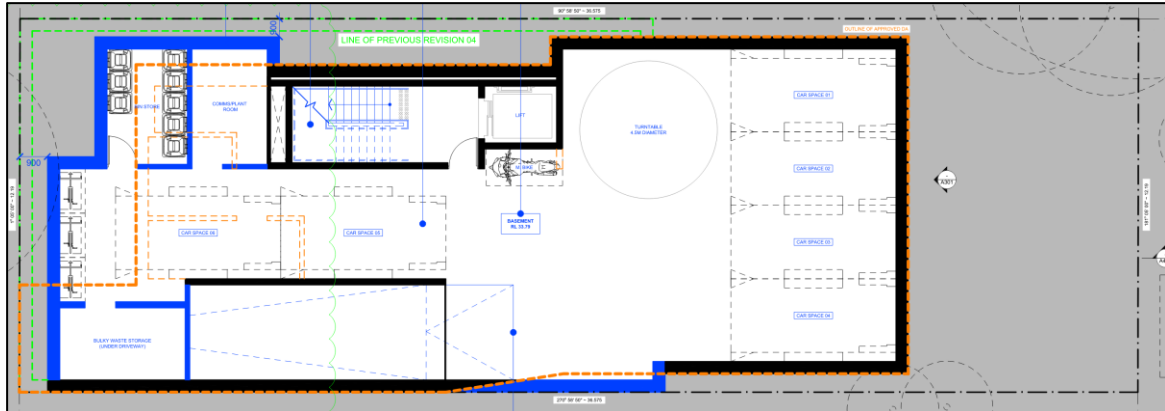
Proposed basement plan (source: Common Office, dated 19/01/2025)
